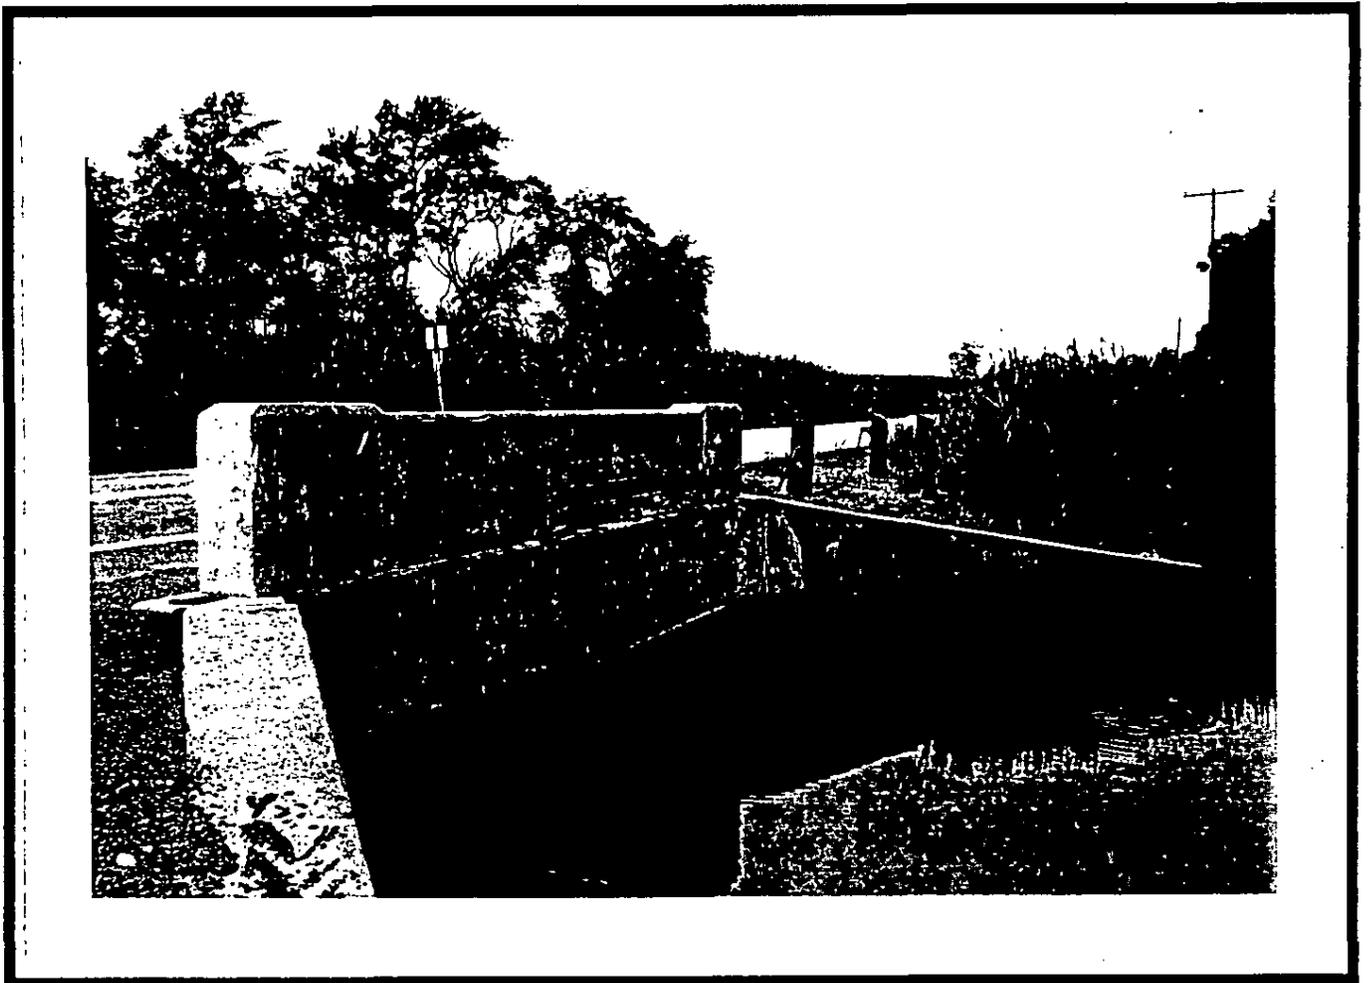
State Route 9 Muddy Branch Bridge (K-6461), Looking West
